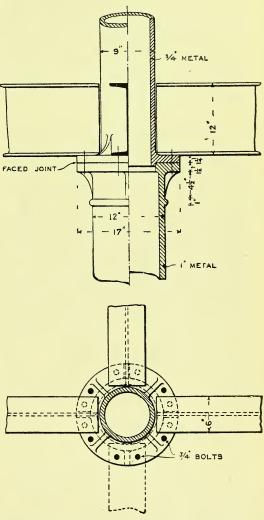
Junction of Rolled Joists on Head of Column.
